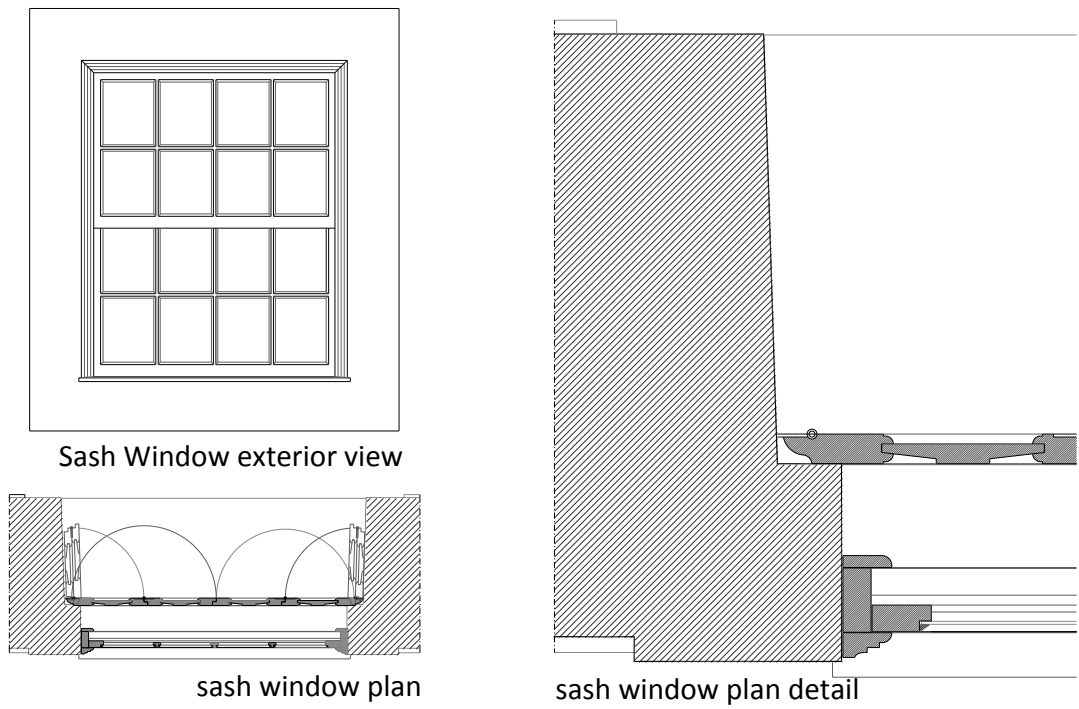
Exterior view, plan and detail of the traditional sash window with inner shutters.
